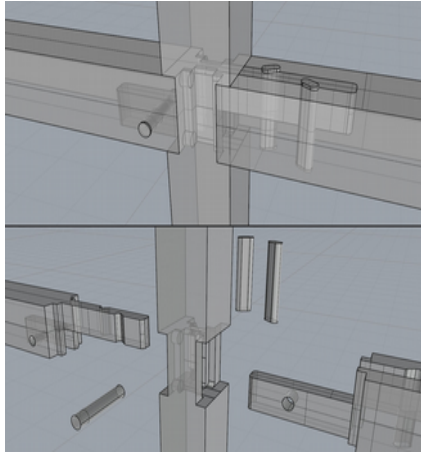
Model of Column-Beam Connection with Pin and Key
